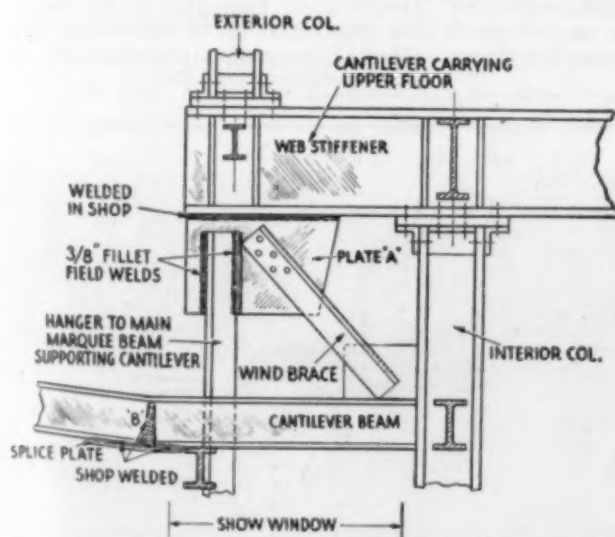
Section view of cantilever construction over show windows which supports marquee and exterior columns for upper floors.
